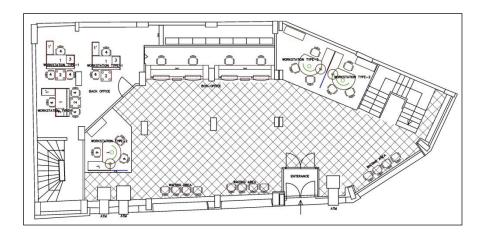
Halk Bank Izmir Bornova branch ground floor plan
